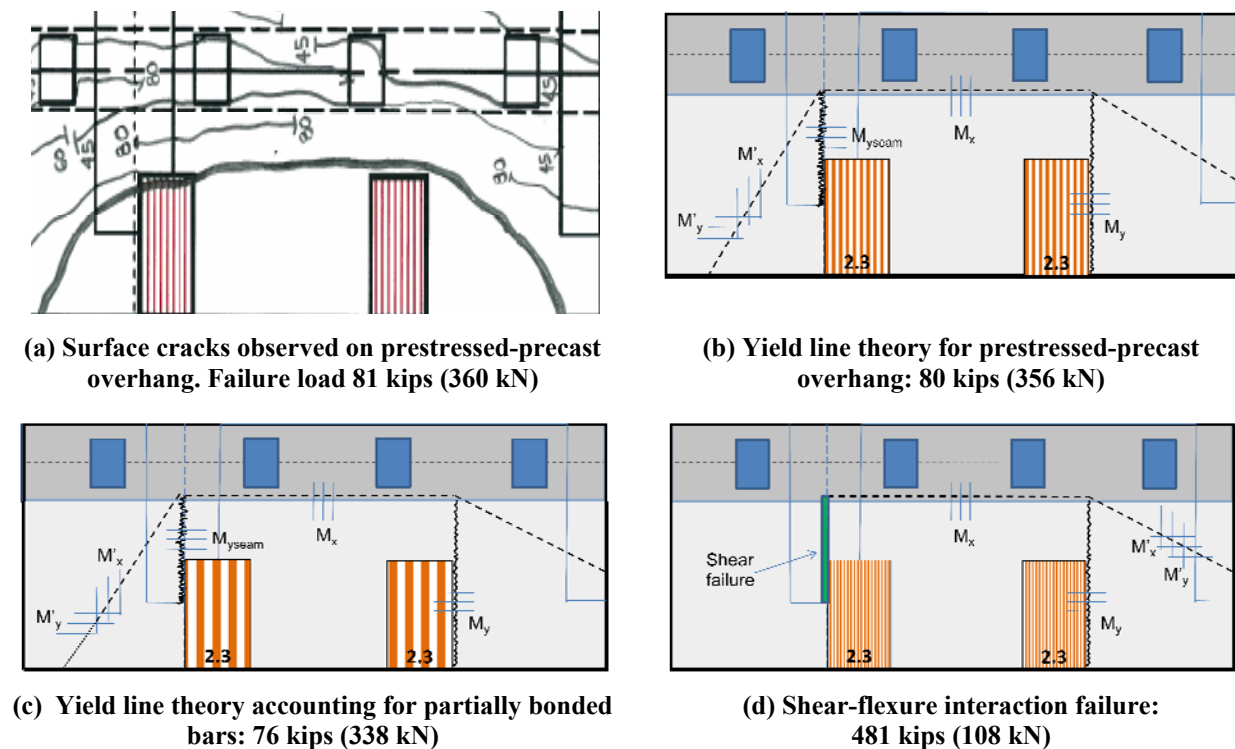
Load Case 2.3; Credible Failure Modes for Prestressed-Precast Overhang with Trailing Wheel Load.
